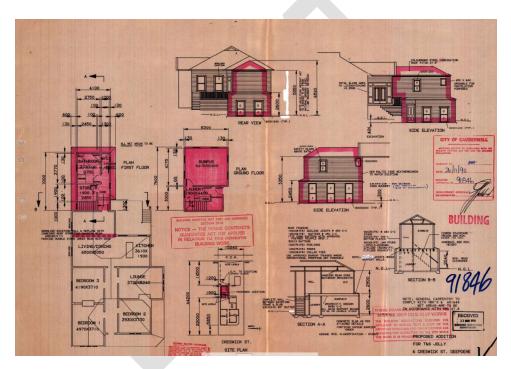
Building plans from 1990, showing a rear extension to the house, providing a bathroom and store at the main floor level and a rumpus room below. (Source: City of Camberwell, BP 91846)
